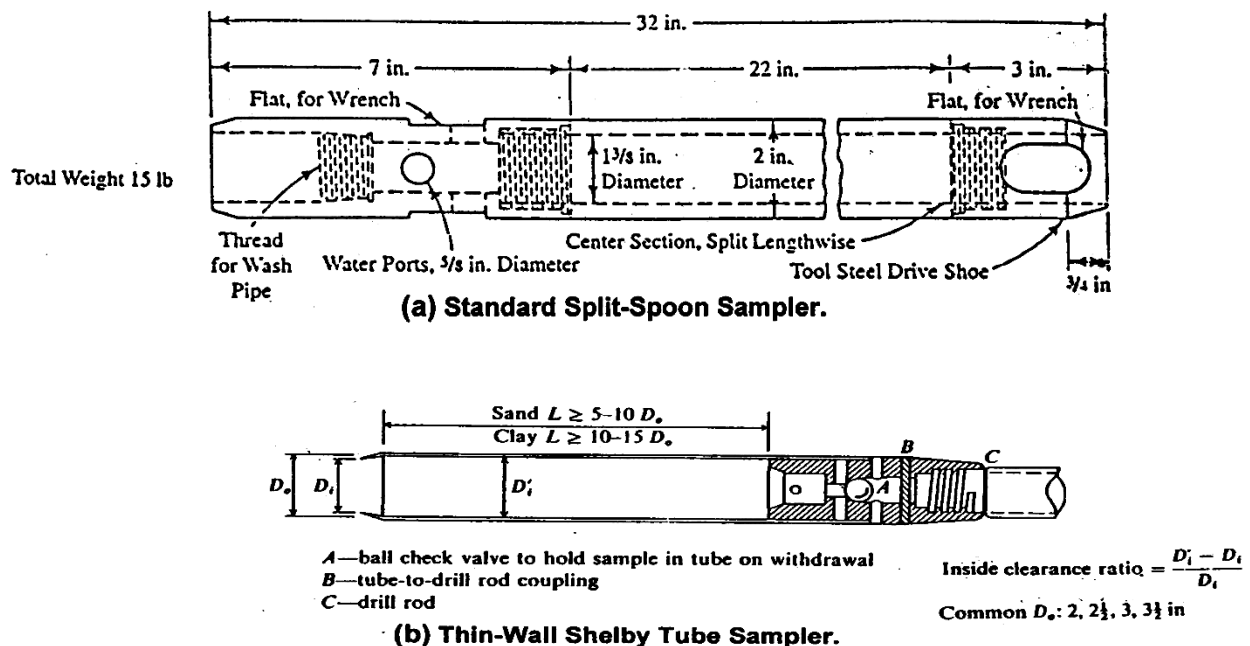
Details of commonly used samplers for in-situ testing (after Moore, 1980).
